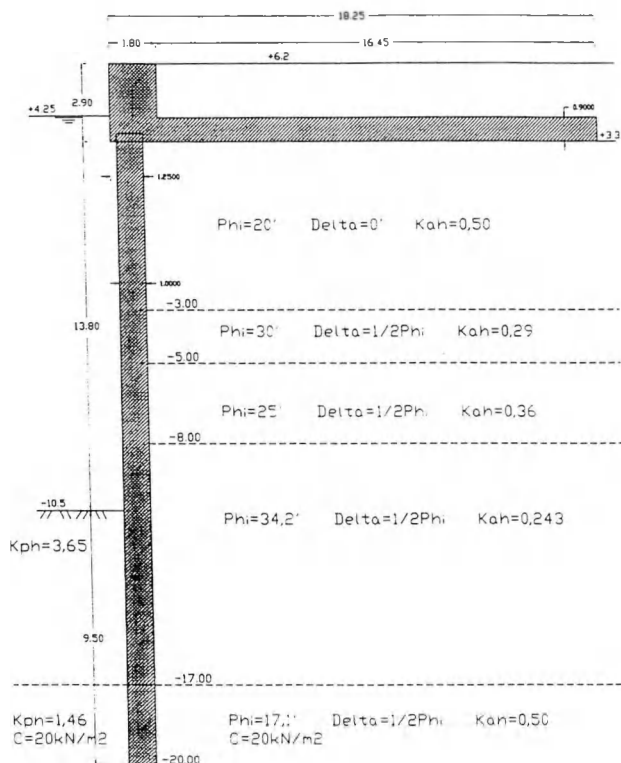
A — Quay wall on slurry wall — Calculation — General basic data.
